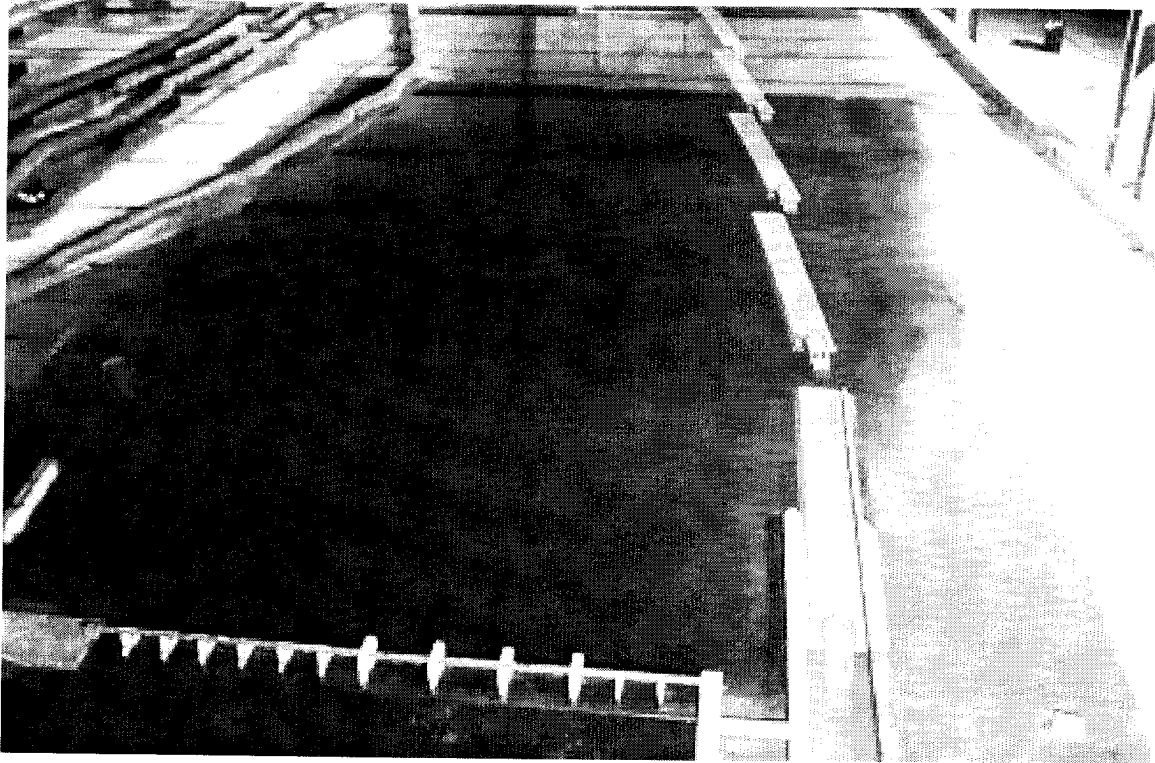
Existing conditions, looking downstream, discharge 162,000 cfs, path of downbound tow leaving 600-ft lock
